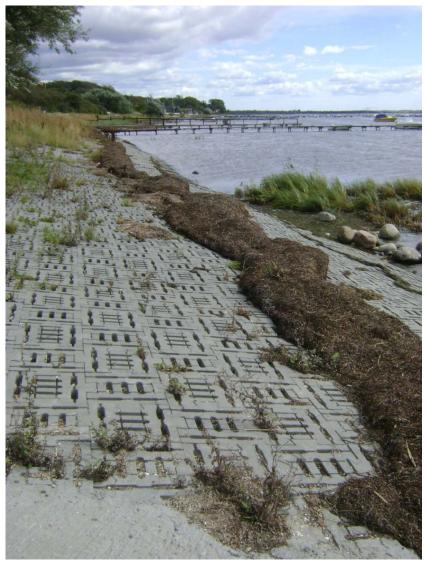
Concrete slabs on the shore in Bjärred (2010-09-03)
